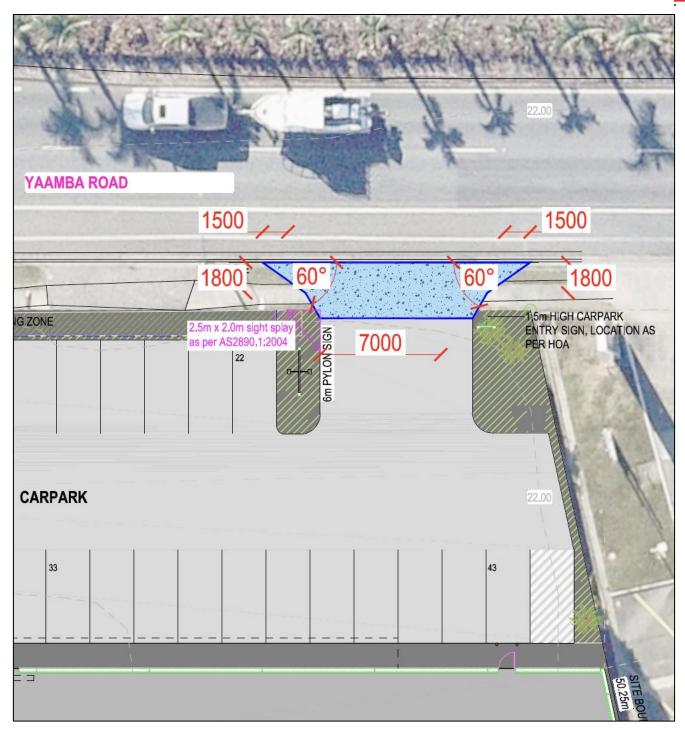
DETAIL A - Detailed Yaamba Road access design
